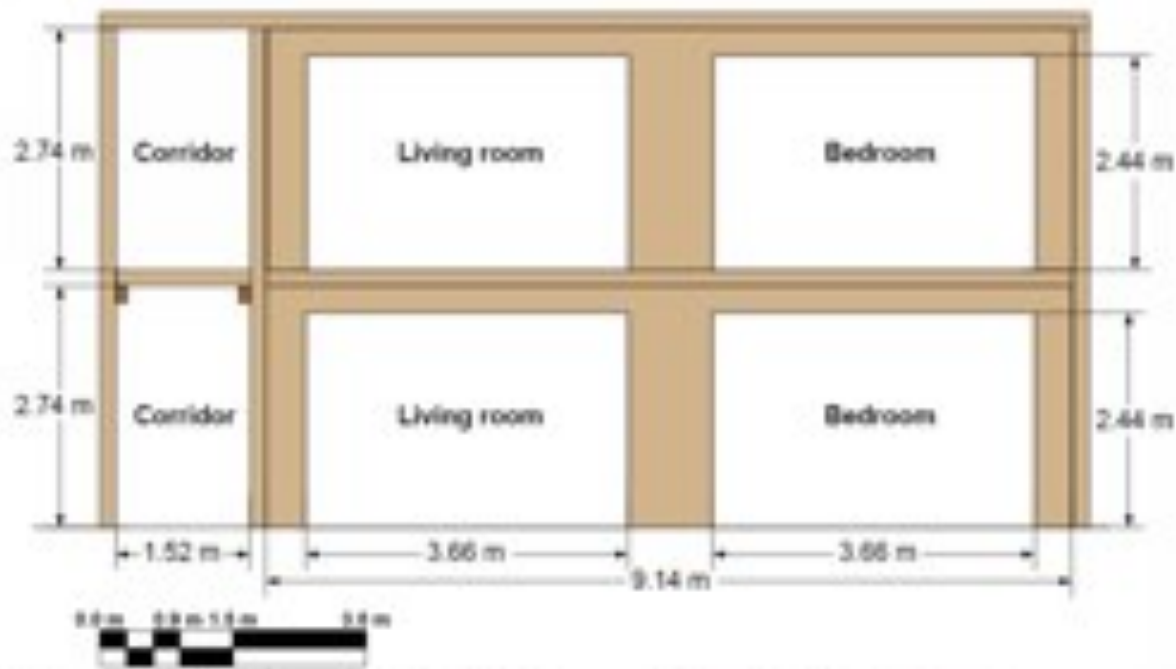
Elevation view of the front of the cross-laminated timber test structure.
